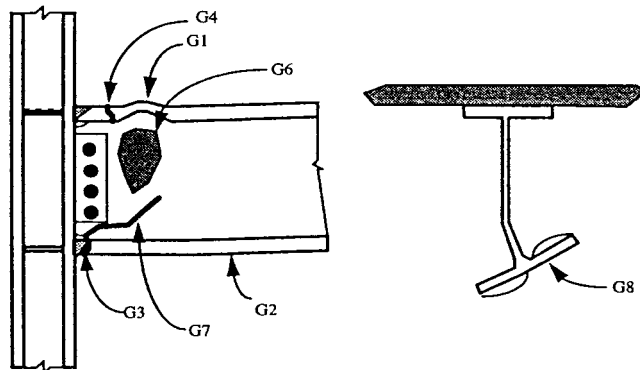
Elements of Welded Steel Moment Frame
